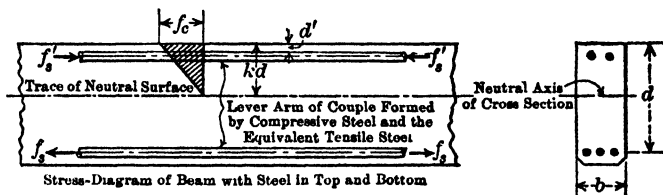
Stress Diagram of a Concrete Beam Reinforced for Both Tension and Compression
